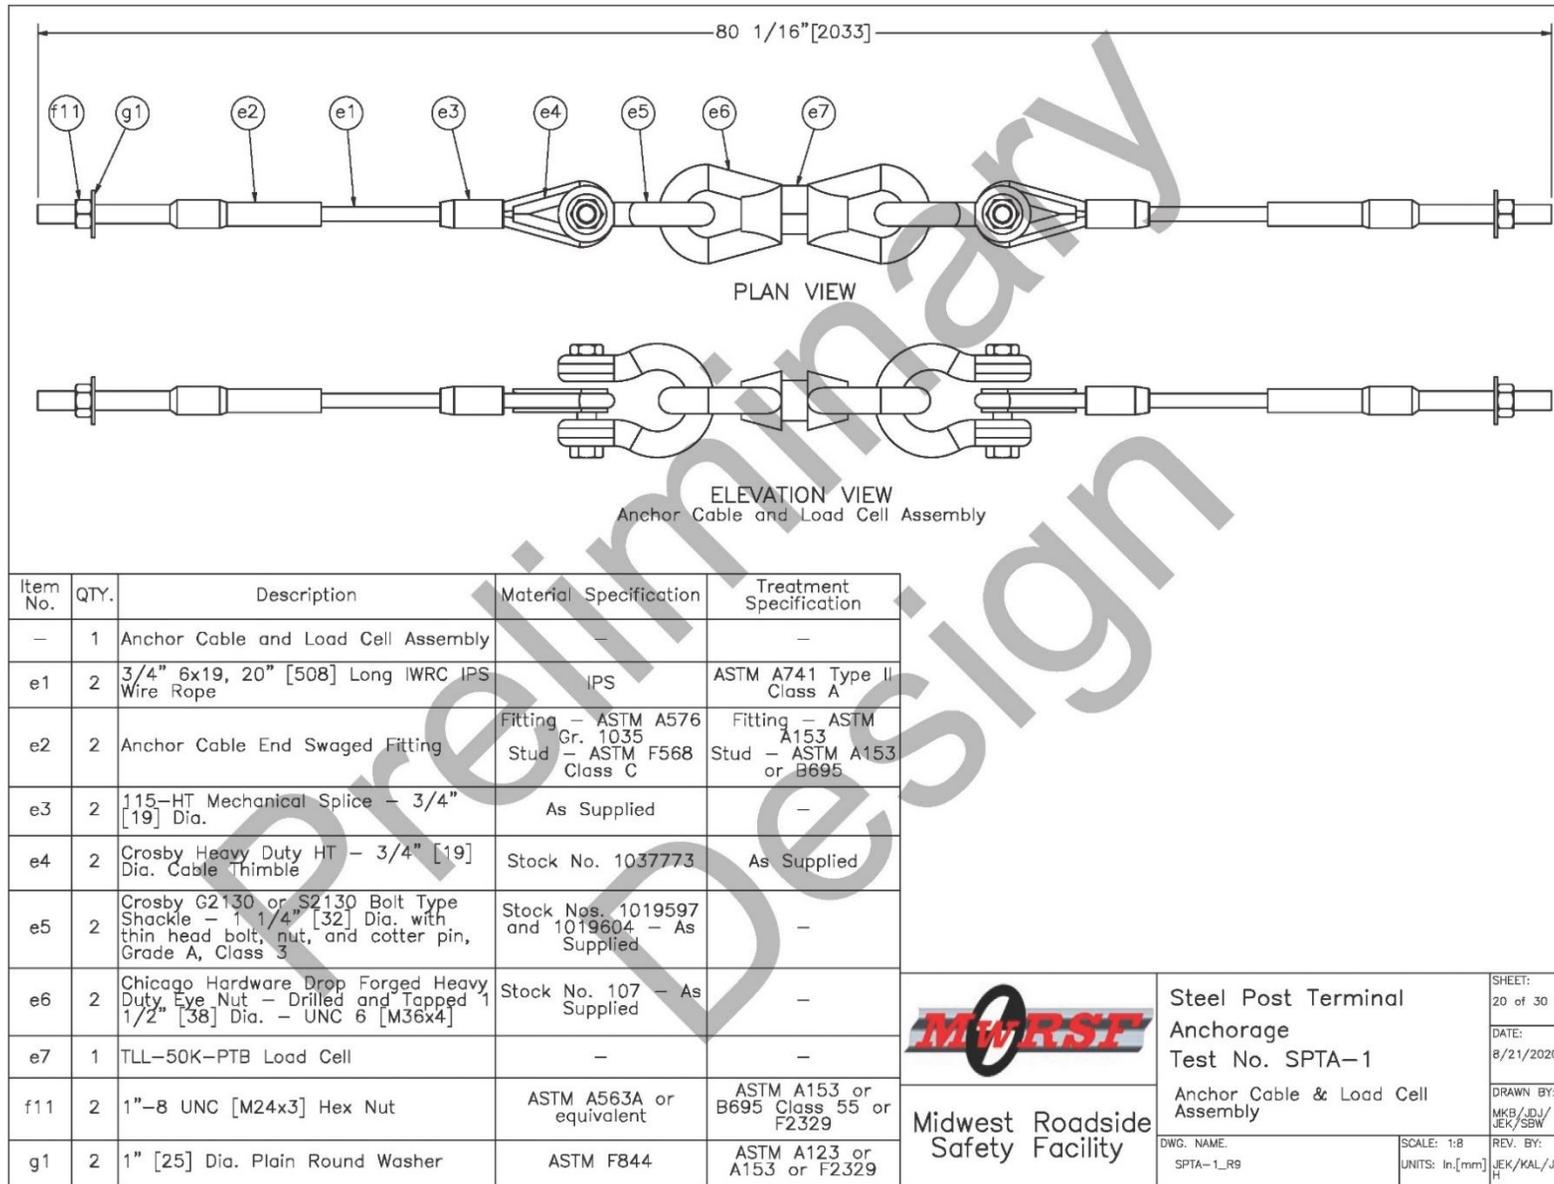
Anchor Cable and Load Cell Assembly, Test No. SPTA-1
